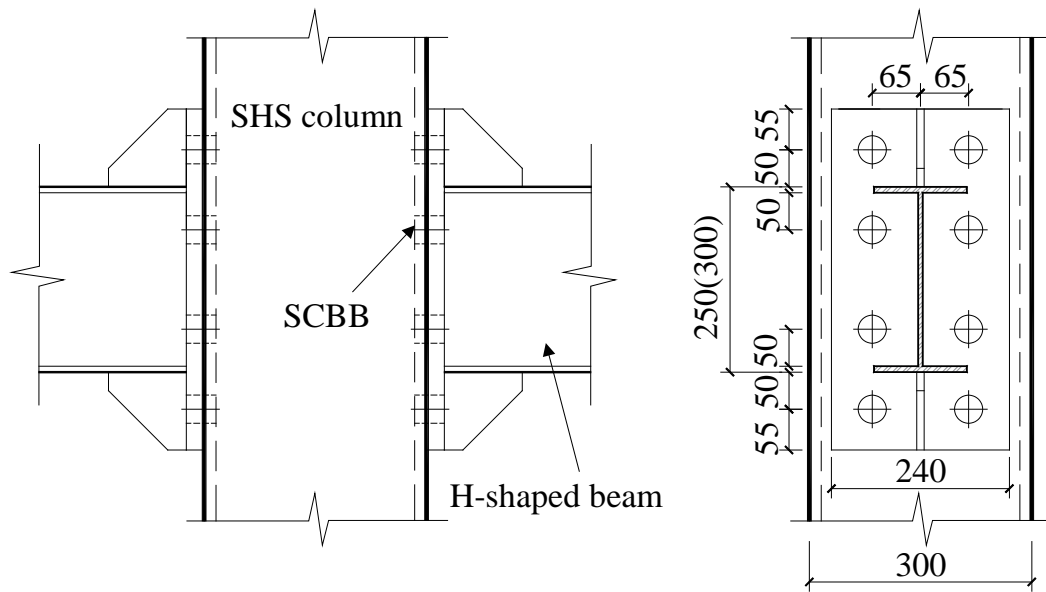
Beam-to-column connection with 4 pairs of SCBBs
